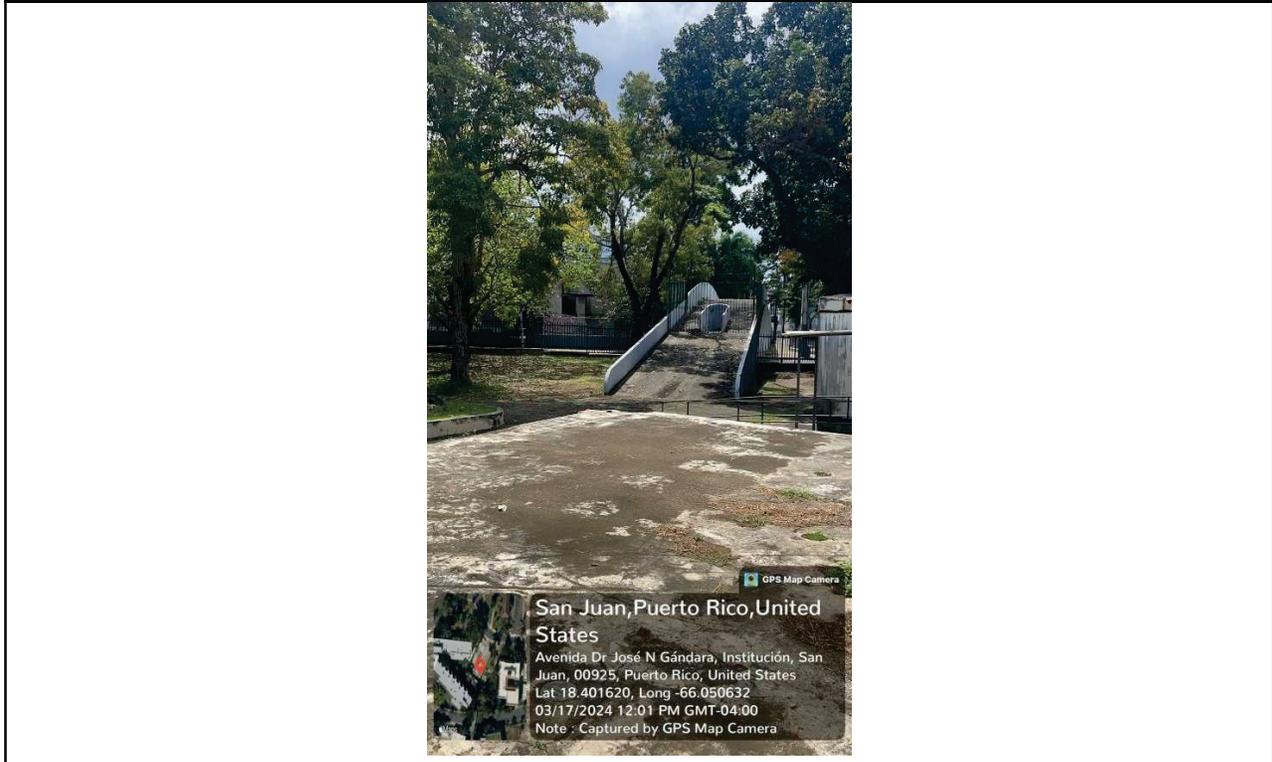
North side view of landing area of Henry Klumb bridge; taken from UPR Rio Piedras Campus, looking south.
